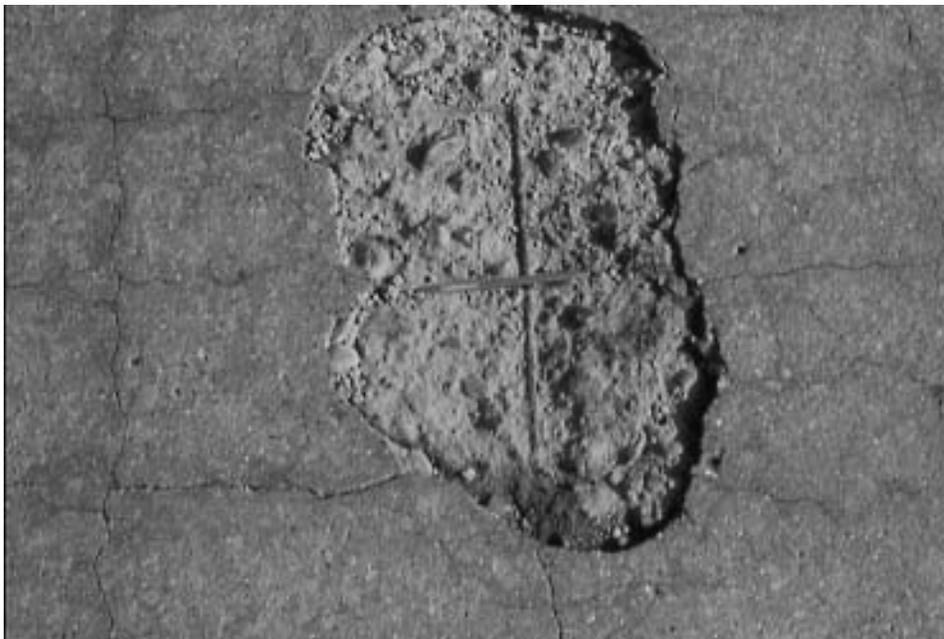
Corrosion of steel reinforcement is an expansive process, which can cause pressure within the concrete and lead to this type of concrete spall. (67217)
